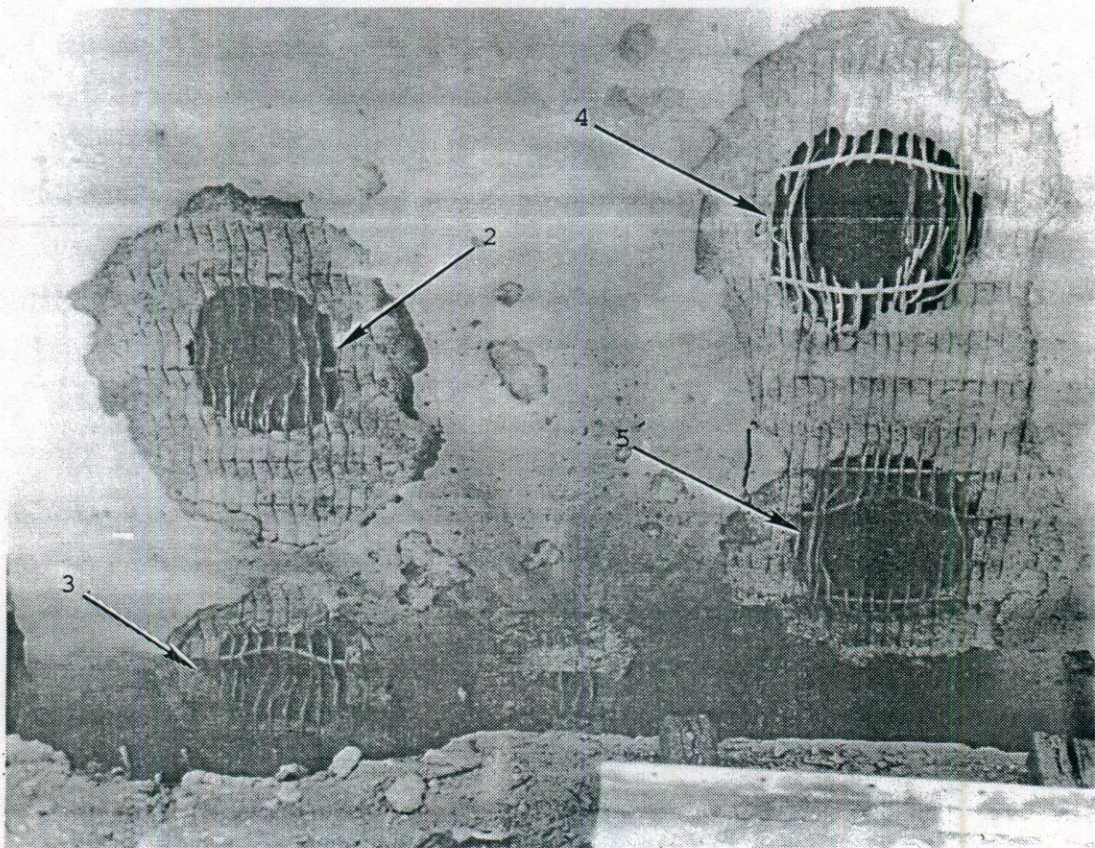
Penetration Tests of 12-Inch-Thick Expanded Metal-Concrete Wall (See Figure 4-17 for Test Data)
